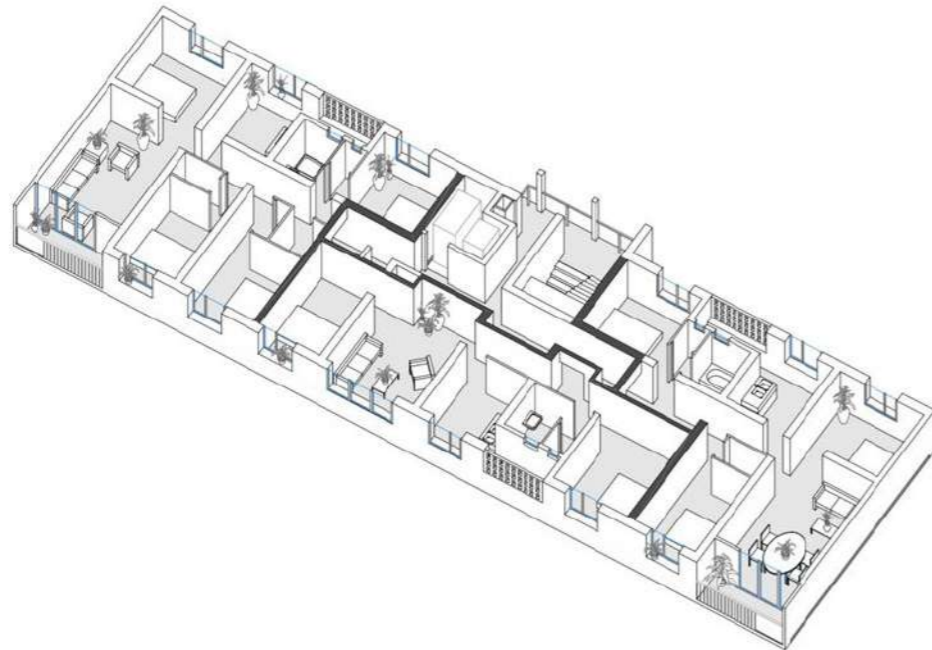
Existing Conditions, buildings H & I typical Floor Plan. © Lacaton&Vassal.
